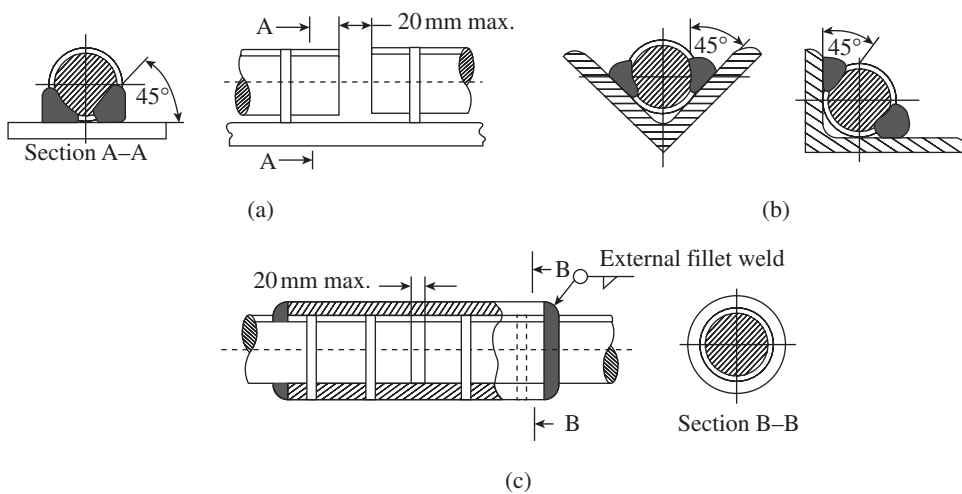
Indirect butt splices (a) Using a plate (b) Using an angle (c) Using a sleeve
